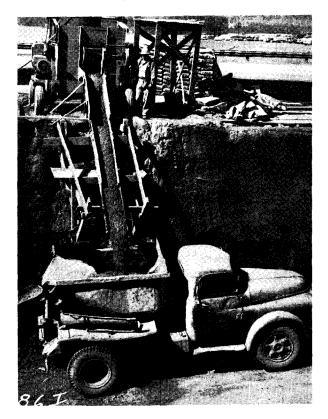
Portable mixers were used to supplement the central mixing plant, and for periods before and after the central plant was in operation.
